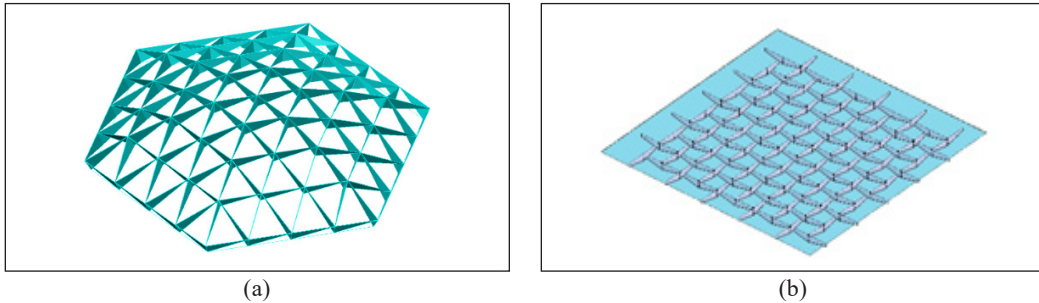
Examples of frameless glass structures: (a) Reciprocal Triple-Connecting glass structure; and (b) Lap panel frameless glass structure
